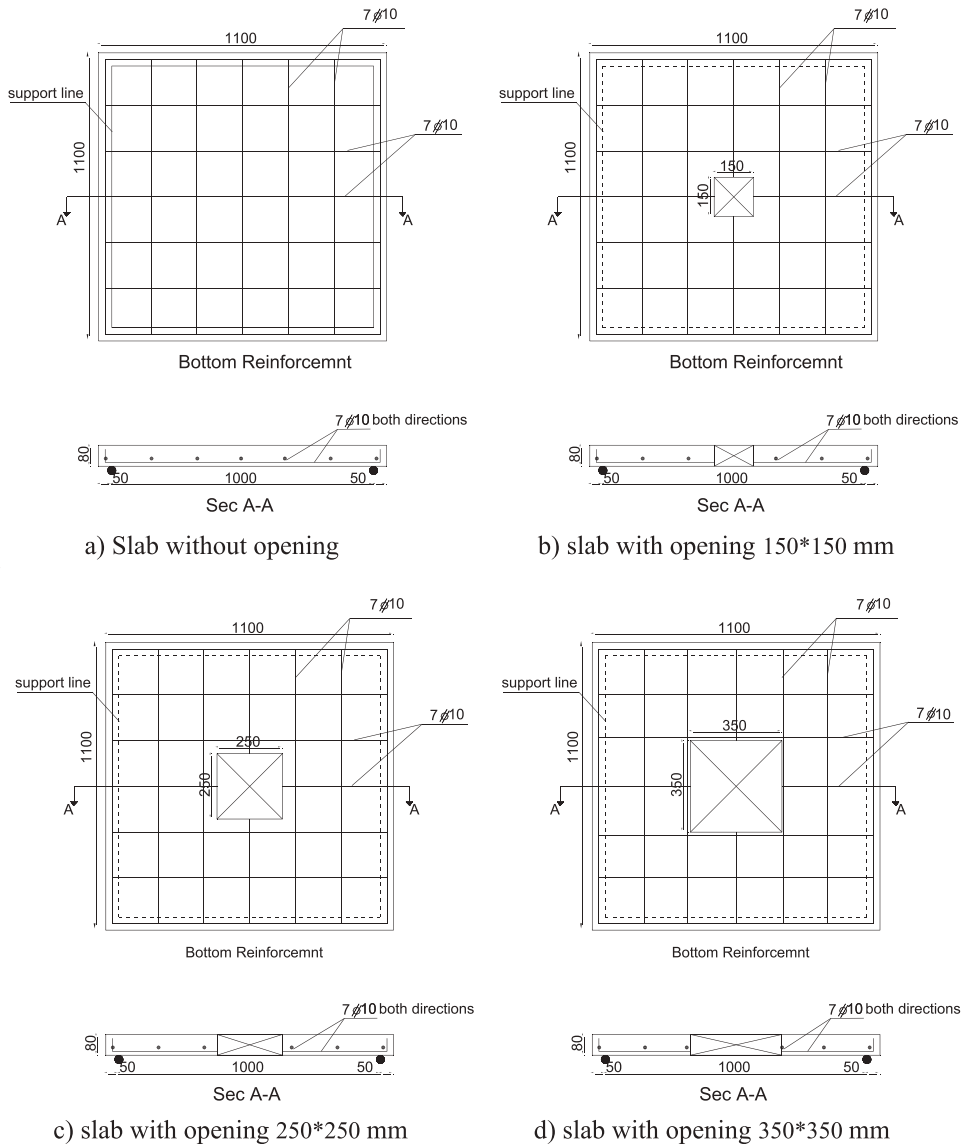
Details and dimensions of tested specimens (all dimensions in mm).
